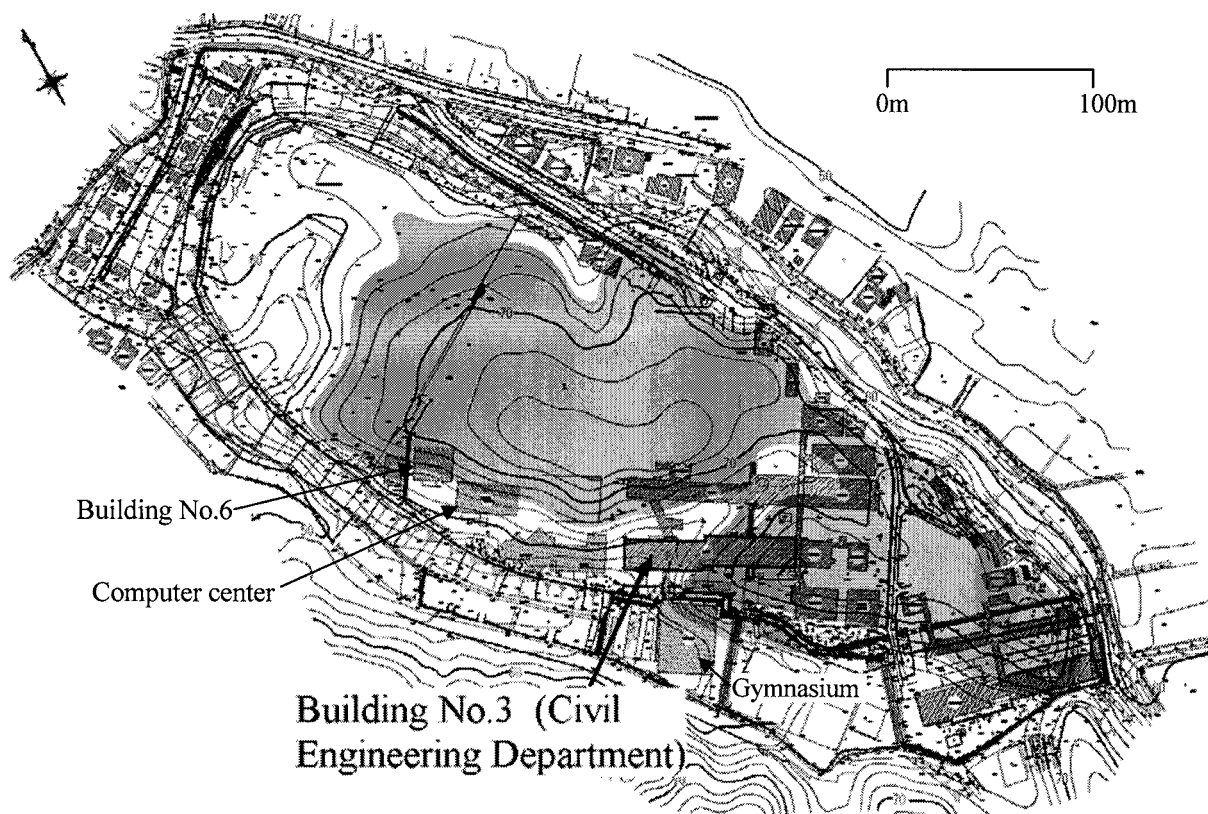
Super imposed buildings and contour map before construction of the site by cutting and filling
